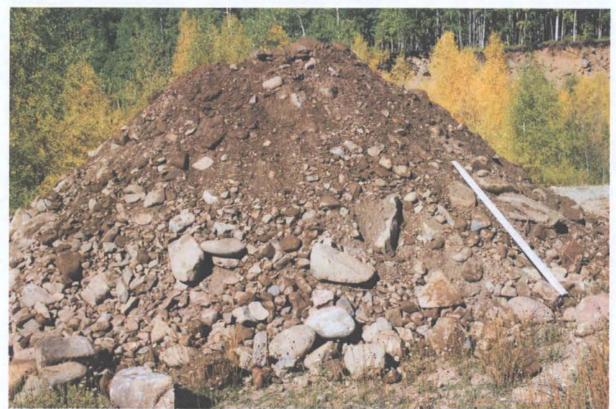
TP2011-15 2' to 10' spoil pile
